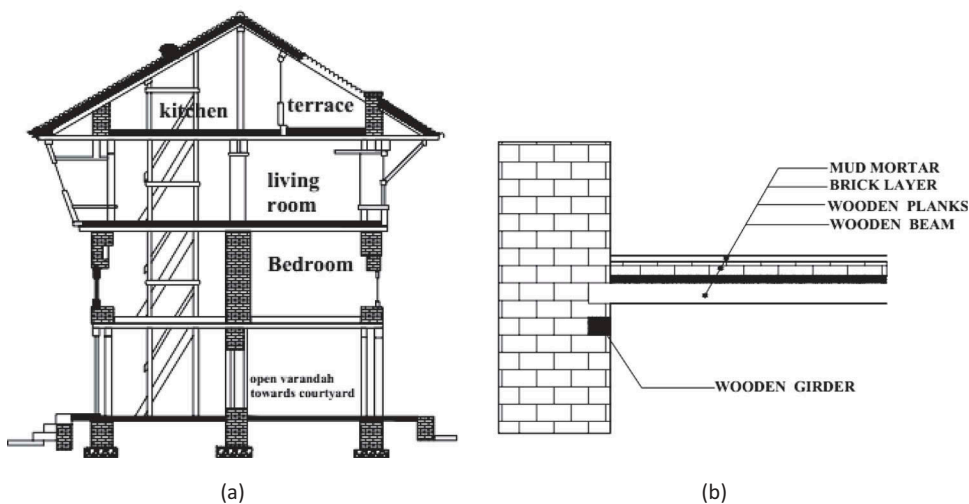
(a) Vernacular Newari building (b) a section of a wall.
